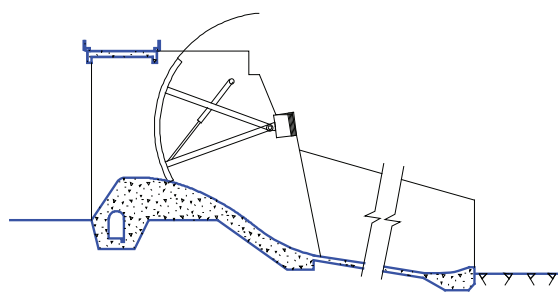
Typical cross-section of a gated abutment spillway.
